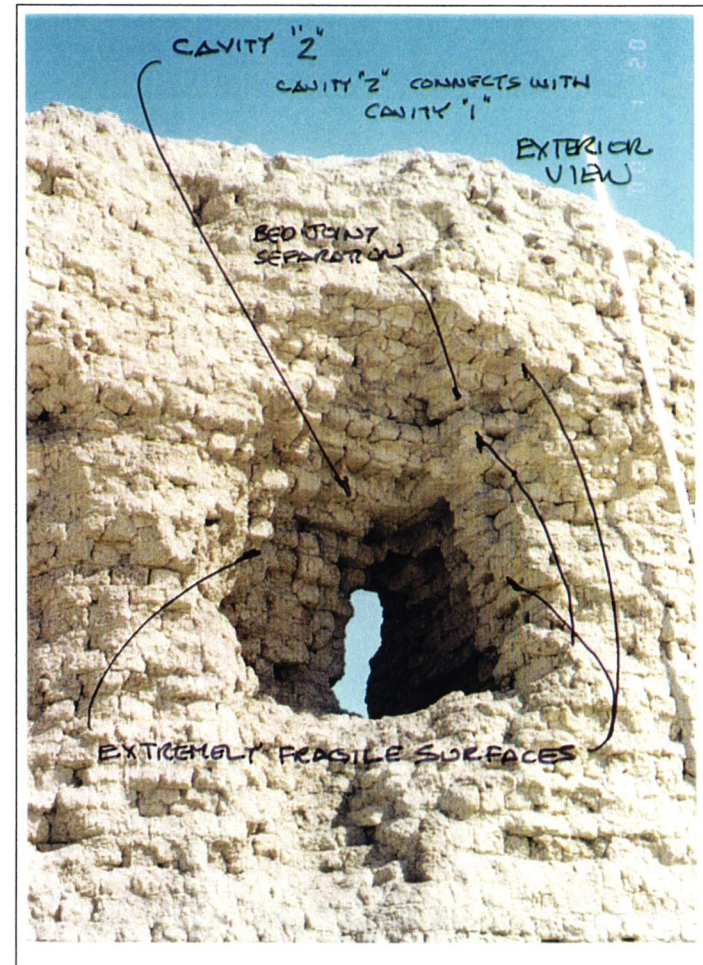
West Main Enclosure Wall, North End, Exterior
